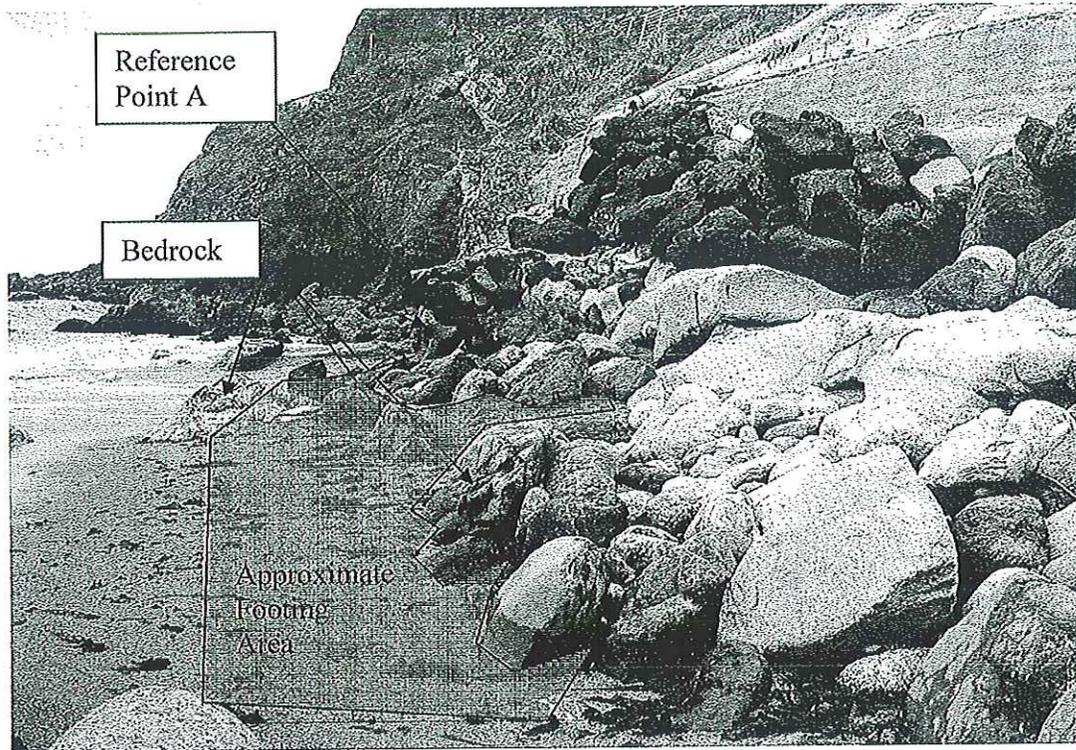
Beach View (The existing elevation, visible on June 18, 2007)
